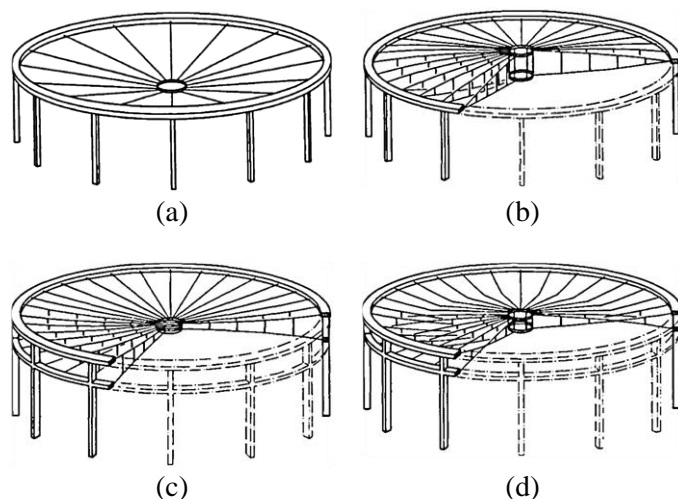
Circular cable roofs with cables suspended in radial planes between central tension ring/s and outer edge ring/s: (a) Simply suspended cable roof; (b) Convex cable beam structure; (c) Concave cable beam structure; (d) Convex-concave cable beam structure.
